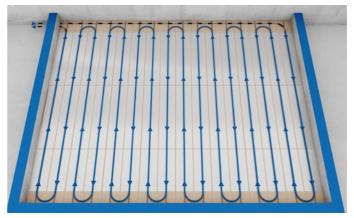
Inlet and outlet for underfloor heating pipes (dotted).
